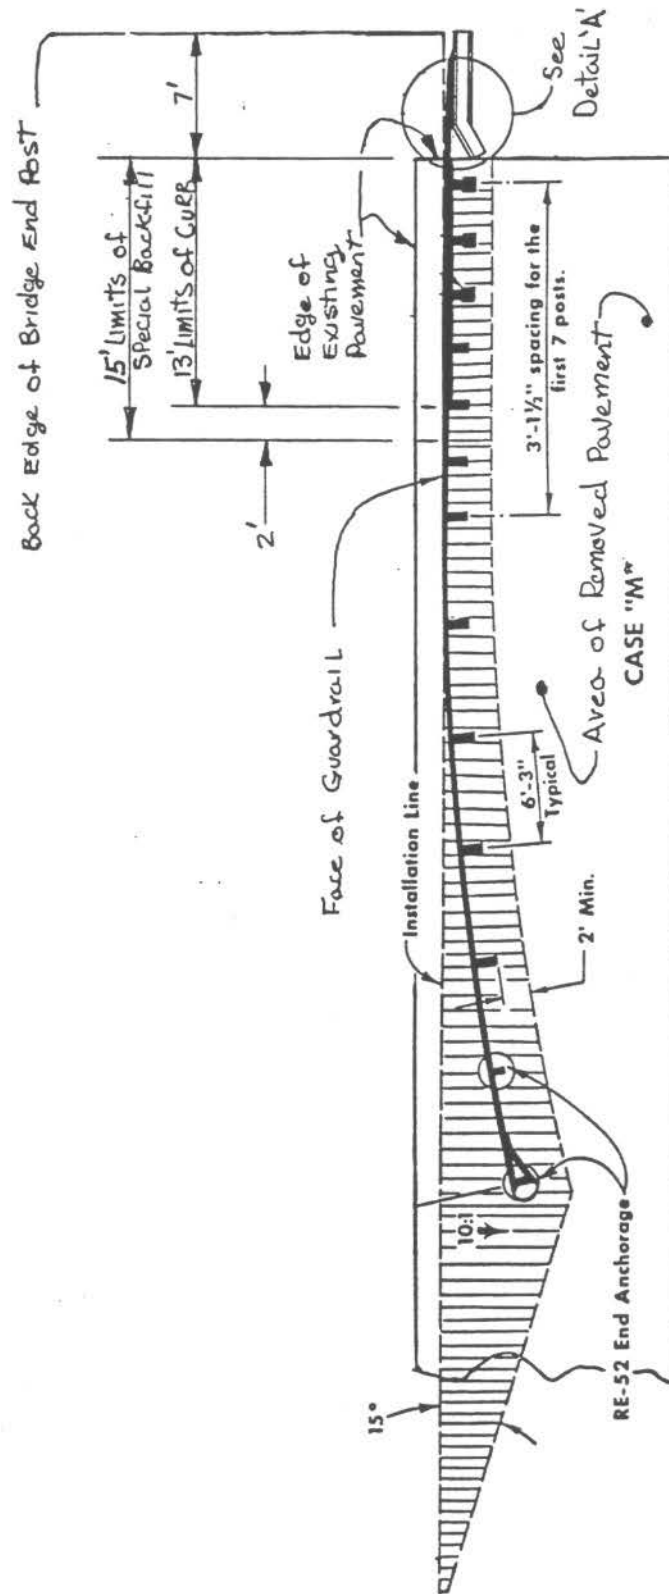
SKETCH OF GUARDRAIL INSTALLATION BRIDGE APPROACH.
